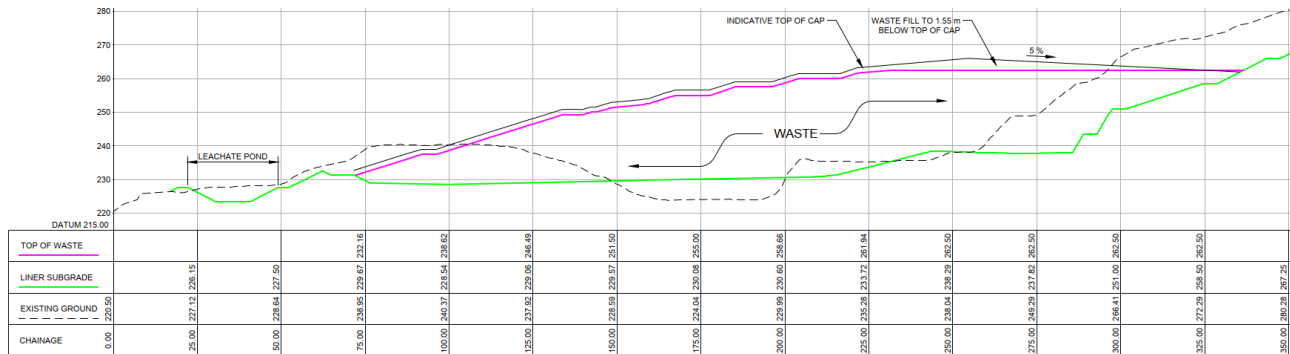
Landfill cross section (Source: WSP Preliminary Design Drawings)
